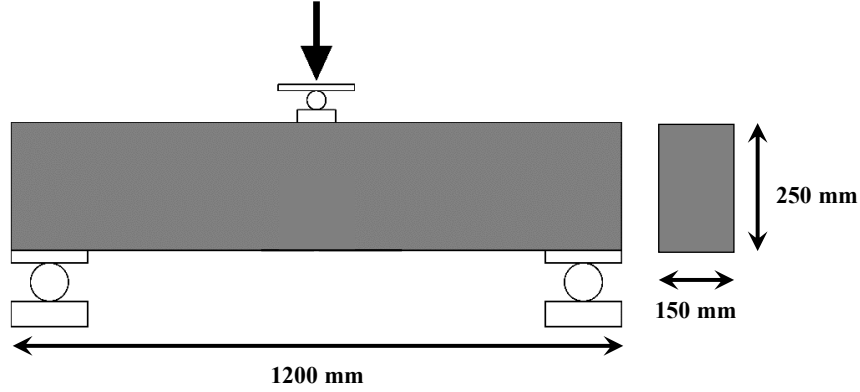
Geometry of the RC beam specimens. The rebars were placed at a distance of 45 mm from the bottom of the beam and the spacing between the rebars was 60 mm.
